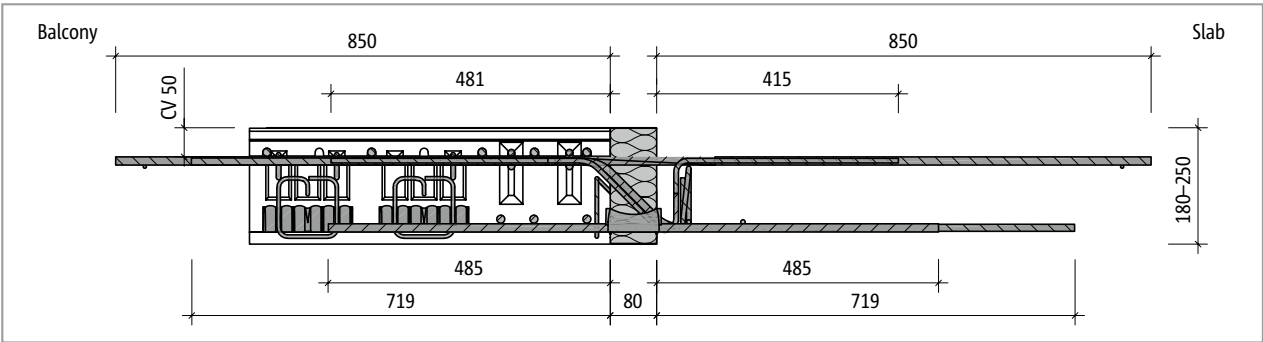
Schöck Isokorb® T type C-M2: Product section
